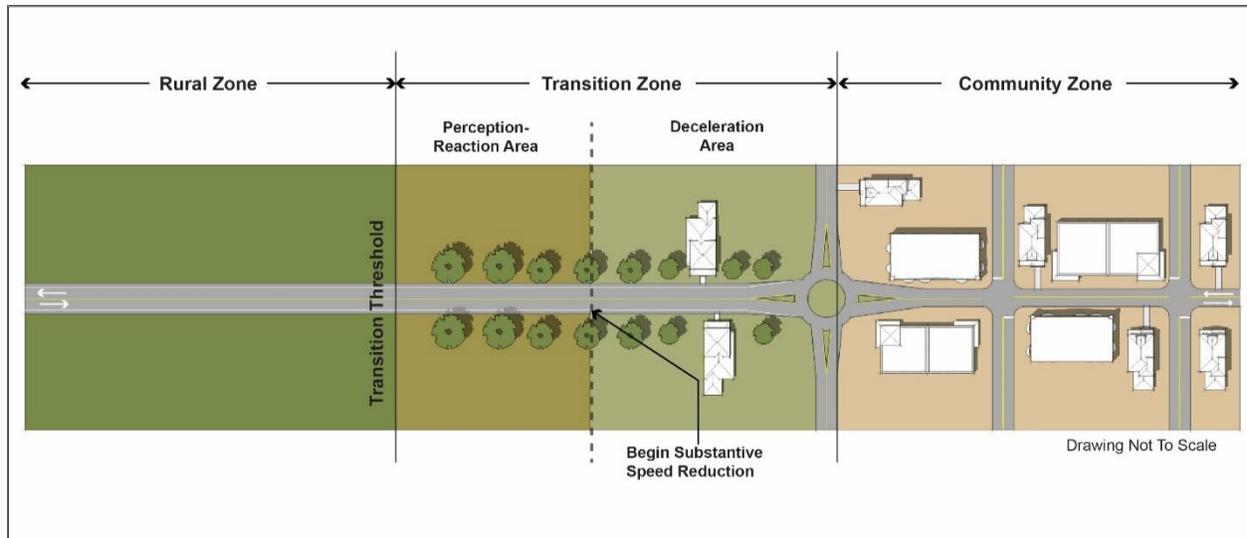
Example of Transition Zone (SR 26 through Newberry, FL)
